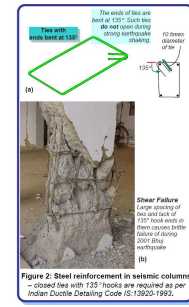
Steel reinforcement in seismic columns – closed ties with 135° hooks are required as per Indian Ductile Detailing Code IS:13920-1993.
